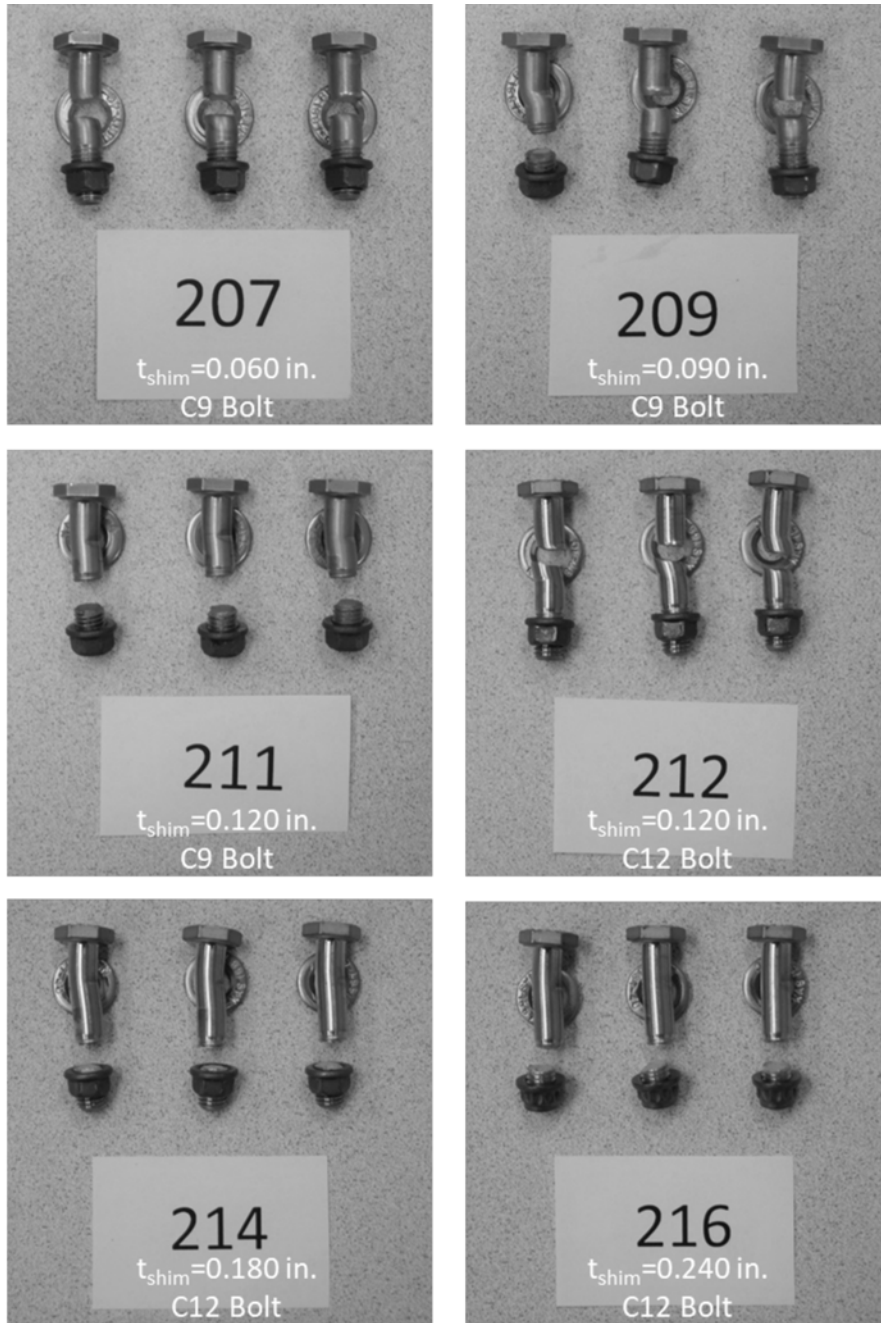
Fractured bolt specimens from select cases loaded in pure shear with aluminum pucks.
